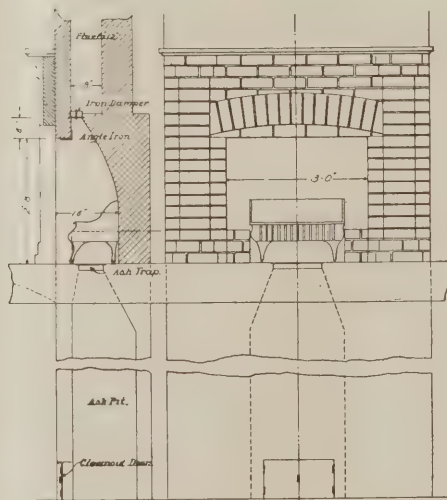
Section and Elevation of Fireplace Showing Chute for Delivering Ashes to the Pit in the Cellar.
